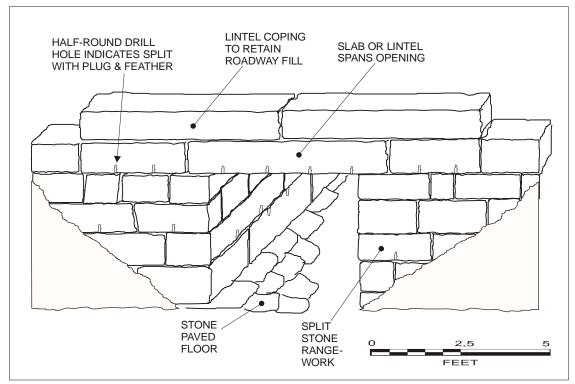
Typical 4-foot stone box culvert of split and cut granite quarry stone
